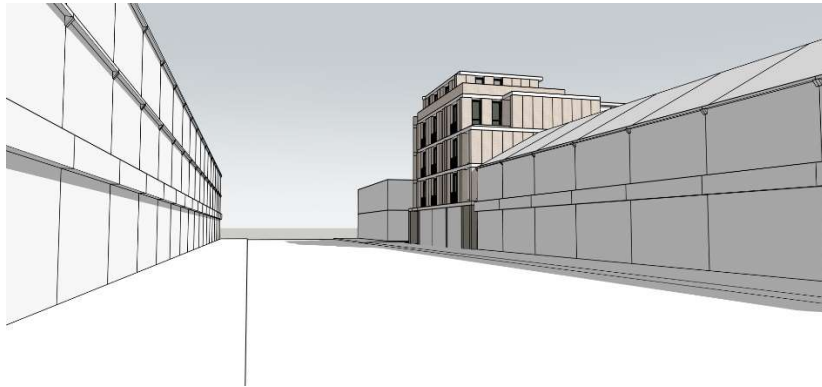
Blatchington Road looking east – Testing an increased potential for height and further detail to the flank wall.
